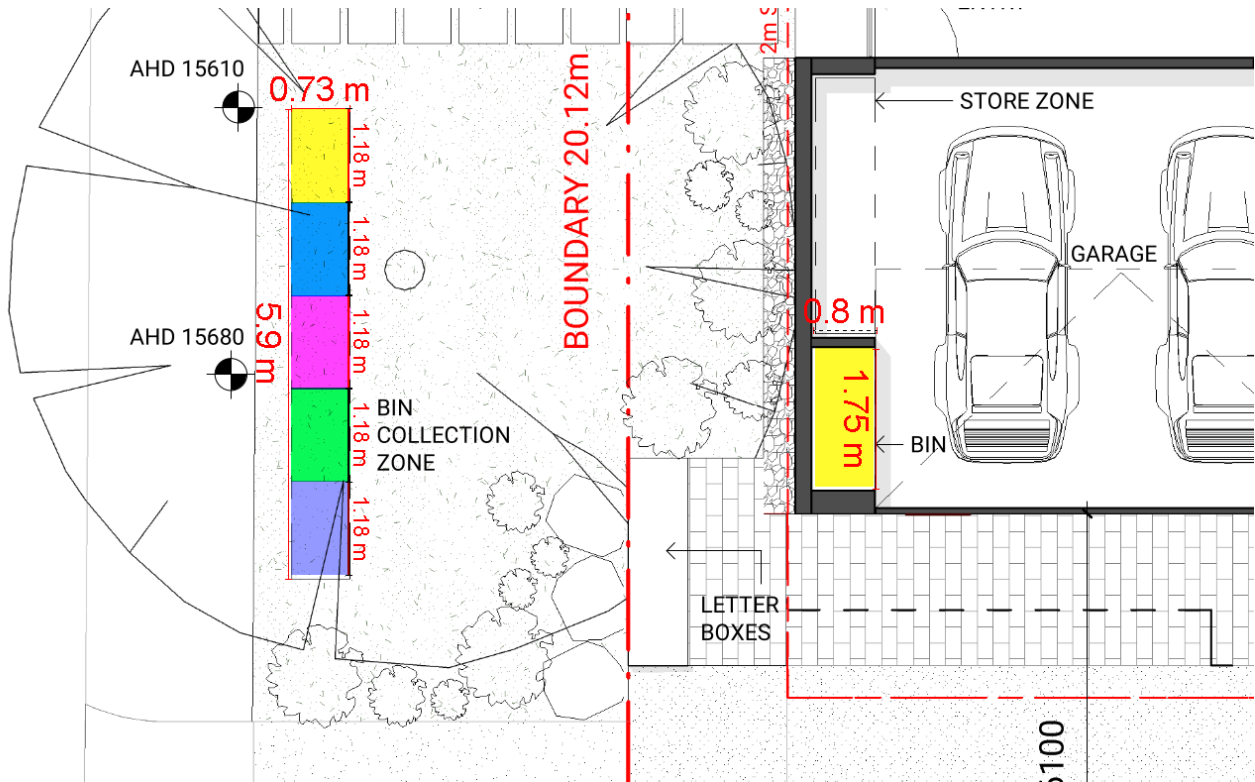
Extract of ground floor plan showing waste collection point from Macrae Road (highlighted)
